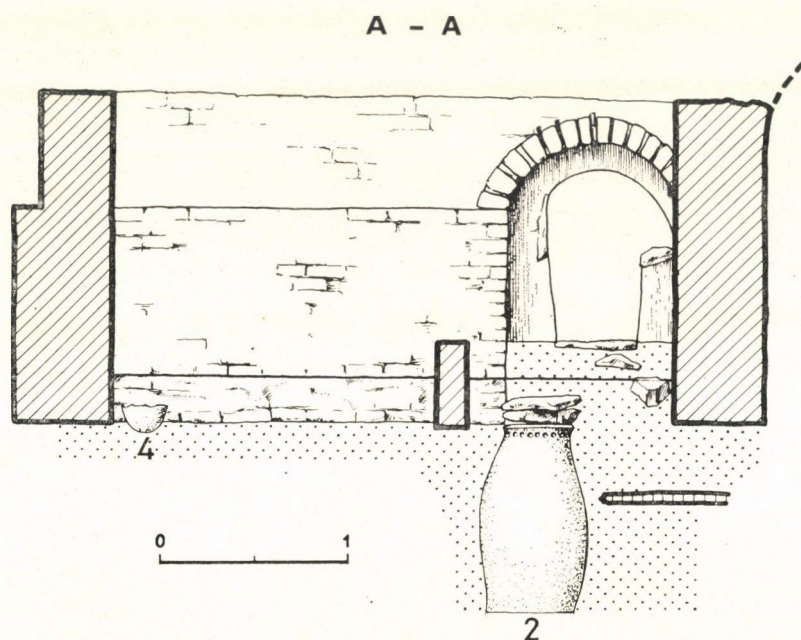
Section of the door between rooms C/I 14 and 15; section A-A
